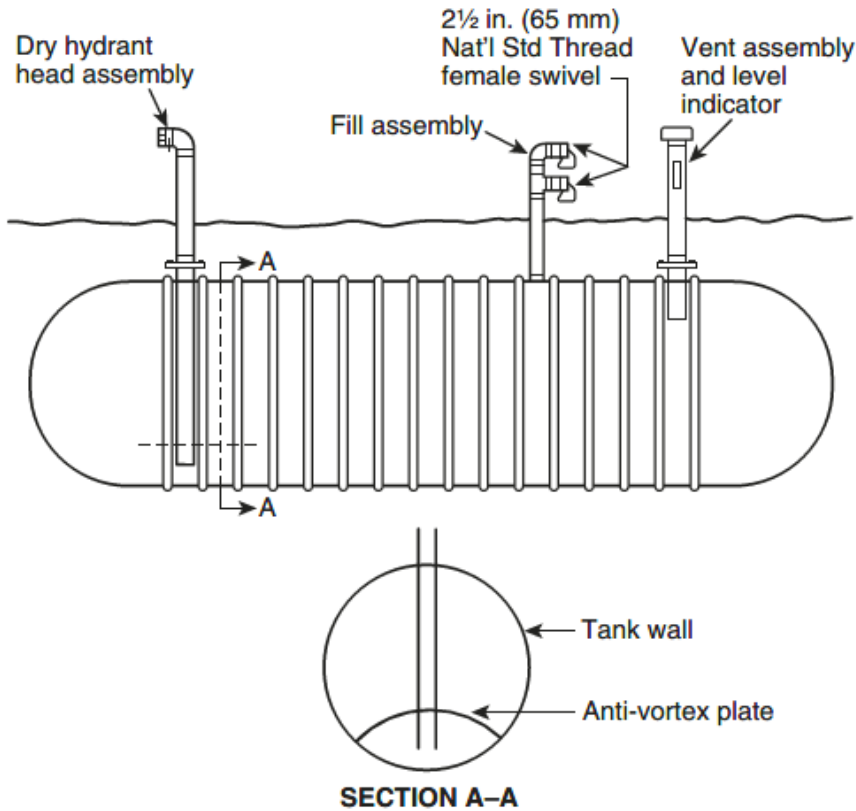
Example of Construction of Water Cisterns Using an Underground Fiberglass Storage Tank.
